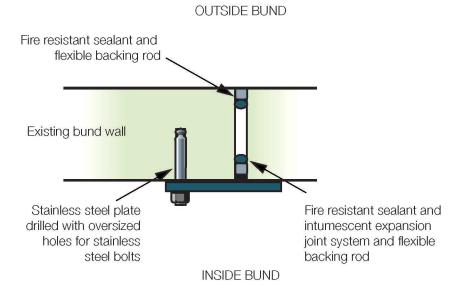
Wall plate joint detail (from HSE, 2009)
